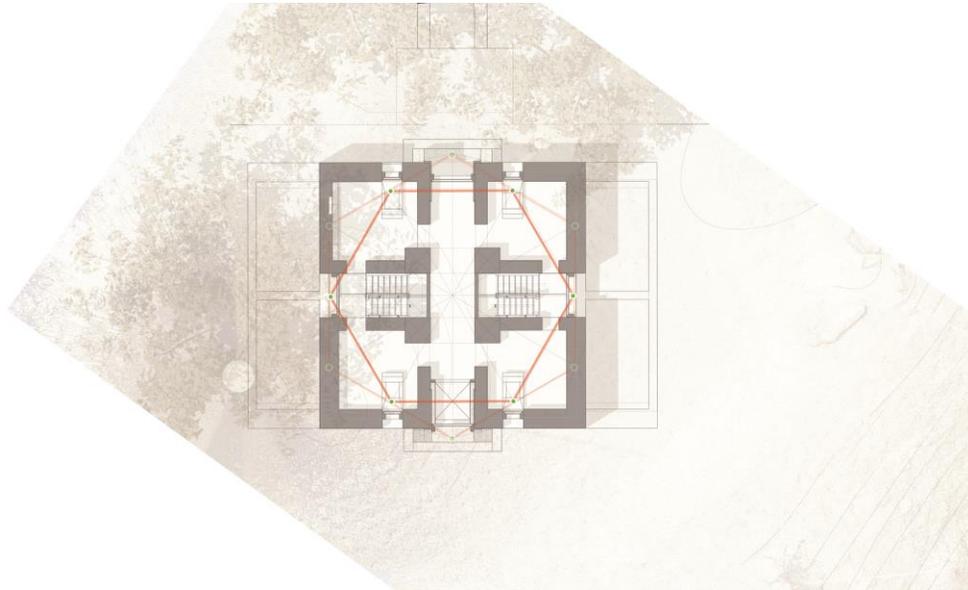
Blackwell Tower: Second Floor Plan Diagram
